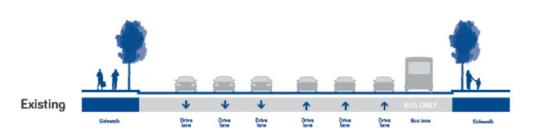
FIGUEROA STREET FROM 11TH STREET TO 7TH STREET
